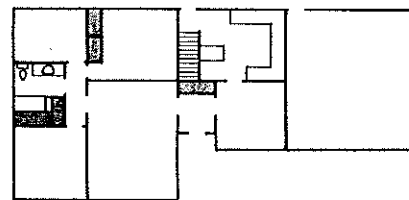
Floor plan of a six-room house with basement. 32'-0" x 68'-0". Furniture and interior decoration should be considered. Minimum ceiling height is 10'-0".
